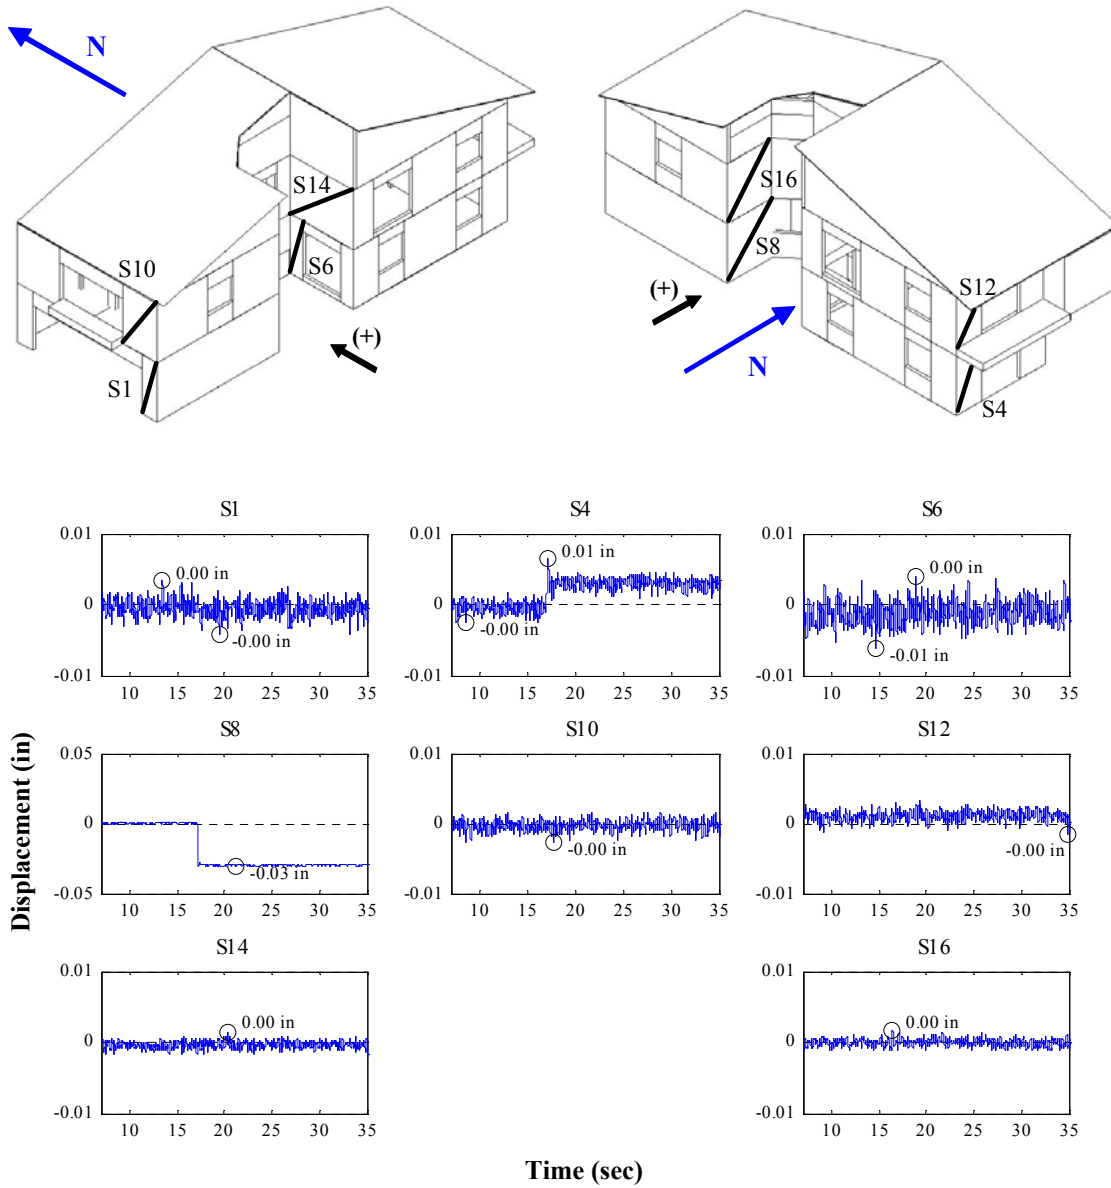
Wall deformations of north-south external walls for Test NWP4S01
